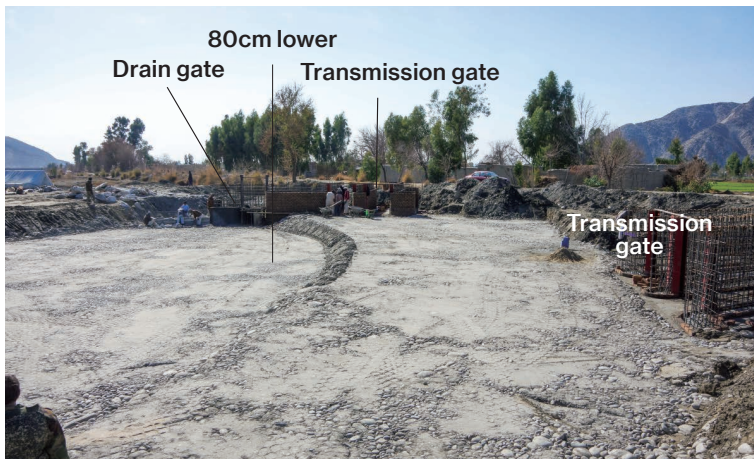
Construction of the Sand Basin Floor (Miran)¹⁾
